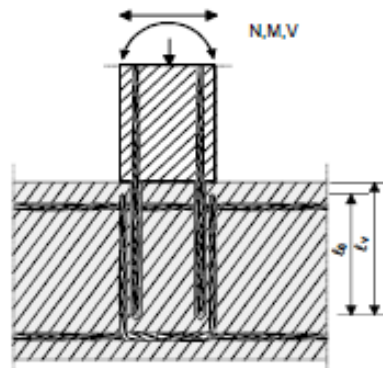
Overlap joint at a foundation of a column or wall where the rebar is stressed in tension
